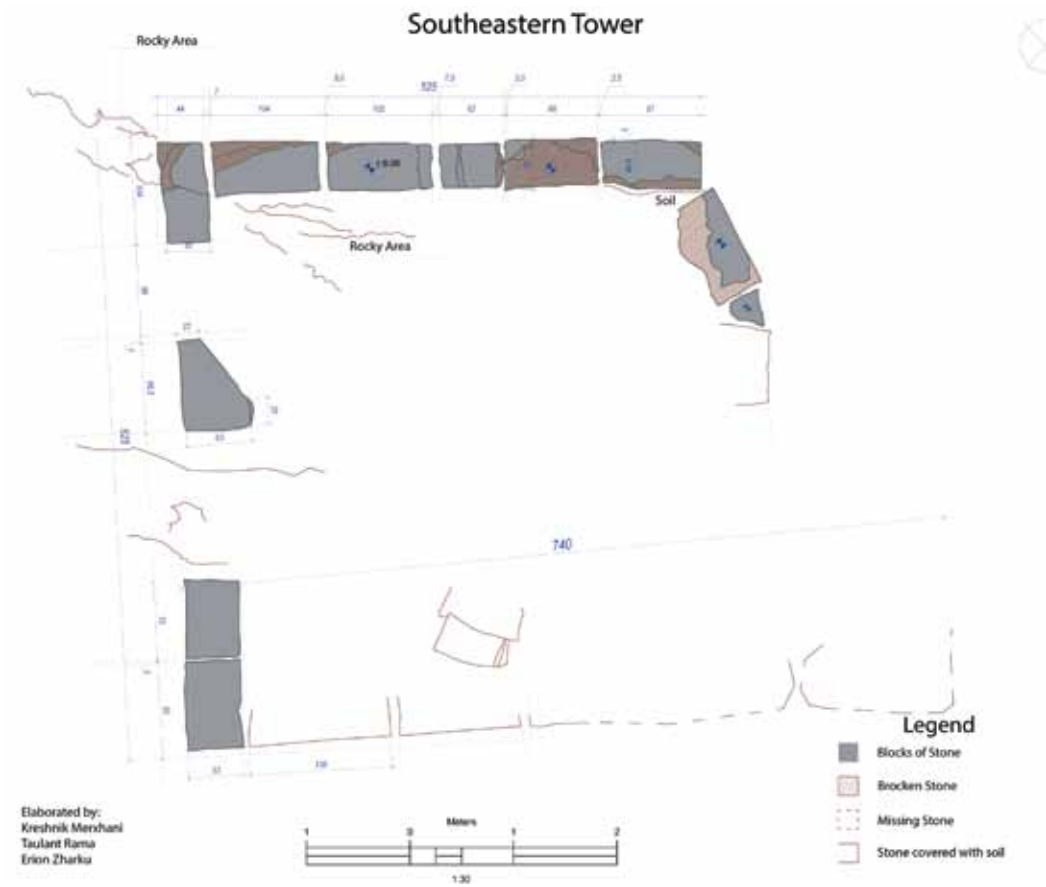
Floor plan of the southeast tower (made by: K. Merxhani, T. Rama, E. Zharku)
